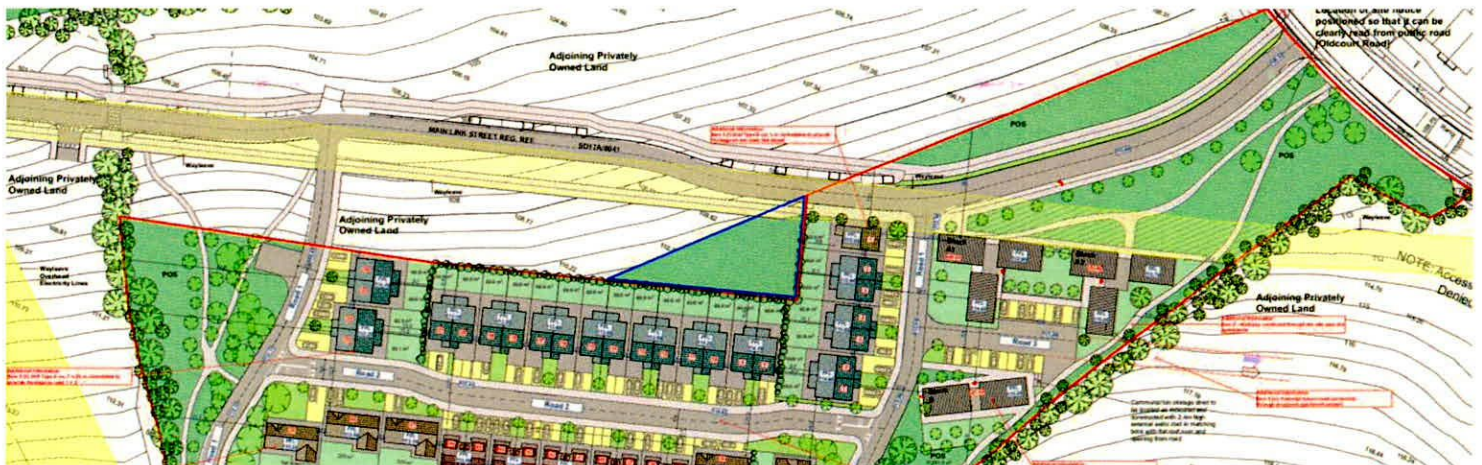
Extract from permitted site layout plan, submitted as Additional Information under Ref. SD17A/0468
